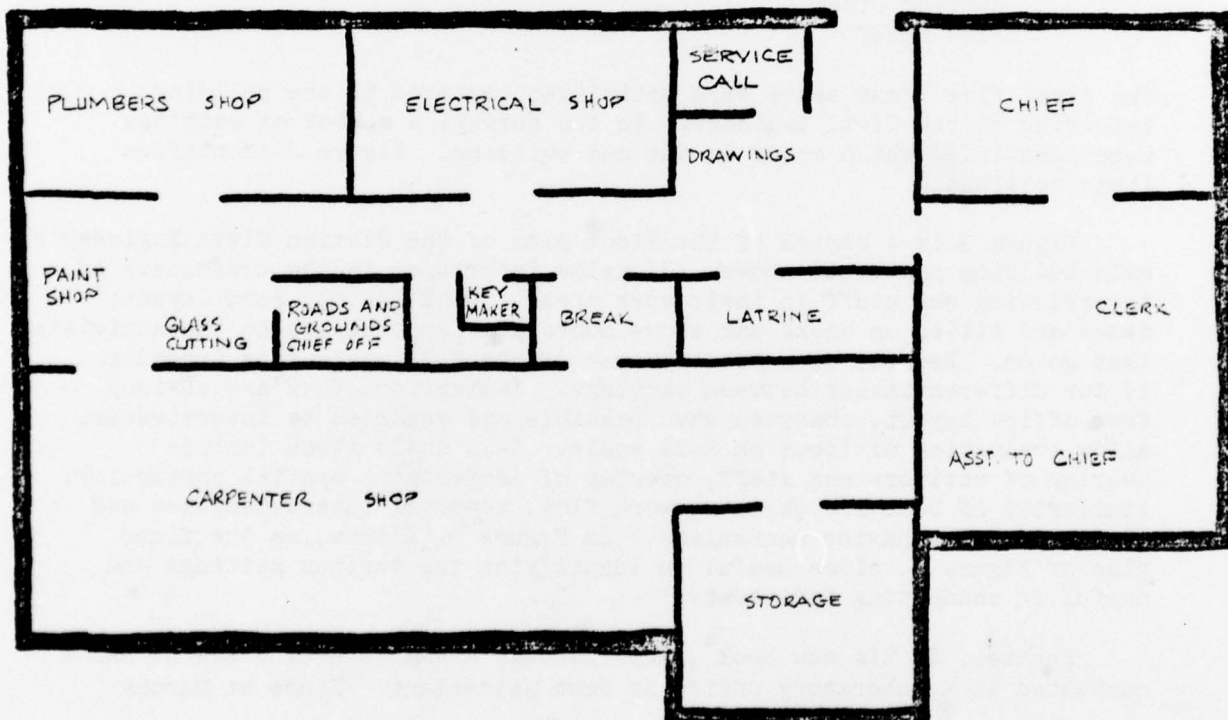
is a sketch of the floor plan of the Station Civil Engineer's main building mentioned above. Of prime importance is the usefulness of interviewing the staff in their work areas. Desk layout, room layout, names and titles on desks and above doors provide clues as to the activities that go on. Bechtel discusses the use of the K-21 scale (see Appendix 1) for differentiating between settings. Indications that are obvious from office layout, observed when possible and reported by interviewees, allow evaluation of items on K-21 scale. K-21 scale items include overlap of visitors and staff, overlap of leadership, spatial contiguity, similarity of behavior objects, work flow, temporal interdependence and similarity of behavior mechanisms. In Figure 4, I show, on the floor plan of Figure 3, clues useful in identifying the various settings and useful in conducting K-21 tests.
